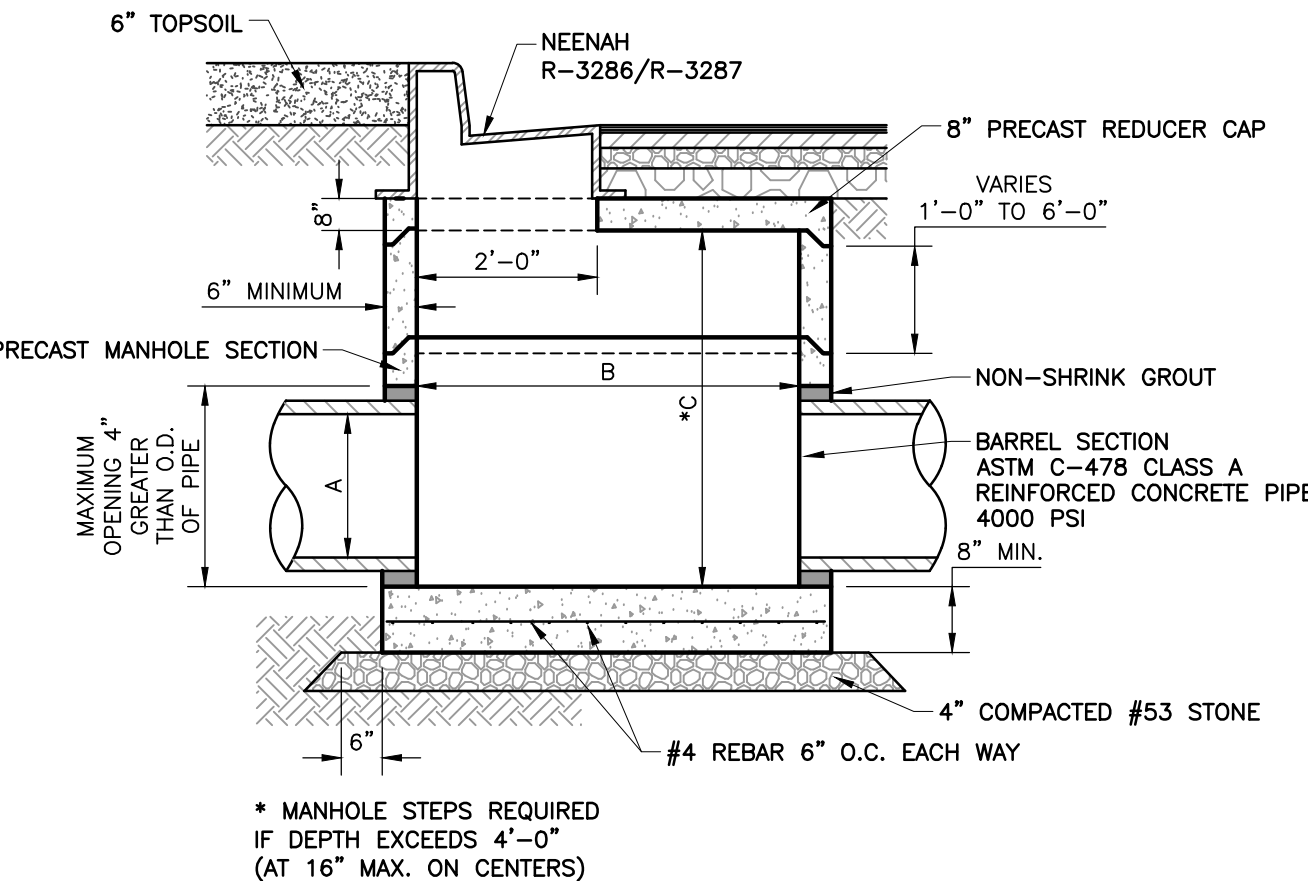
PAVEMENT INLET TYPE 'A'
